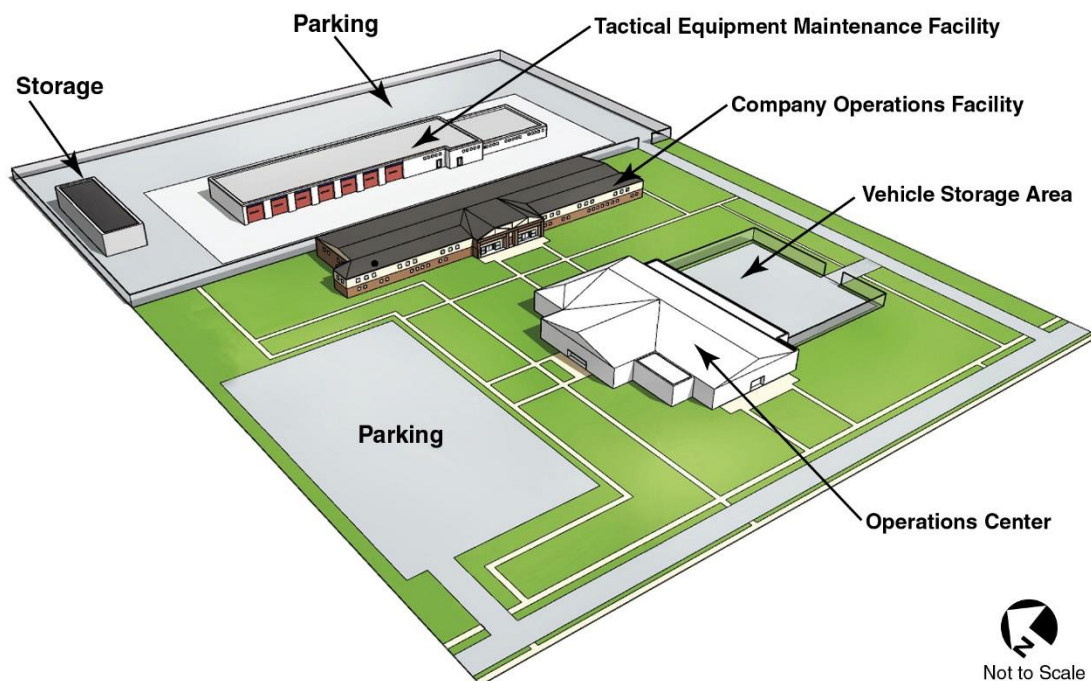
MDTF Conceptual Site Plan – Base Configuration
